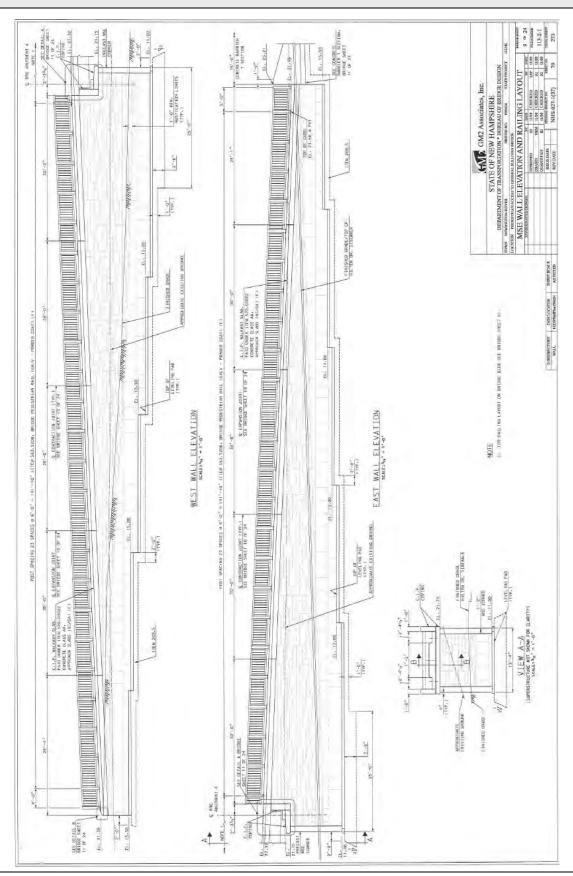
2009 plans for the new north bridge approach and abutment modification, MSE Wall Elevation and Railing Layout.
